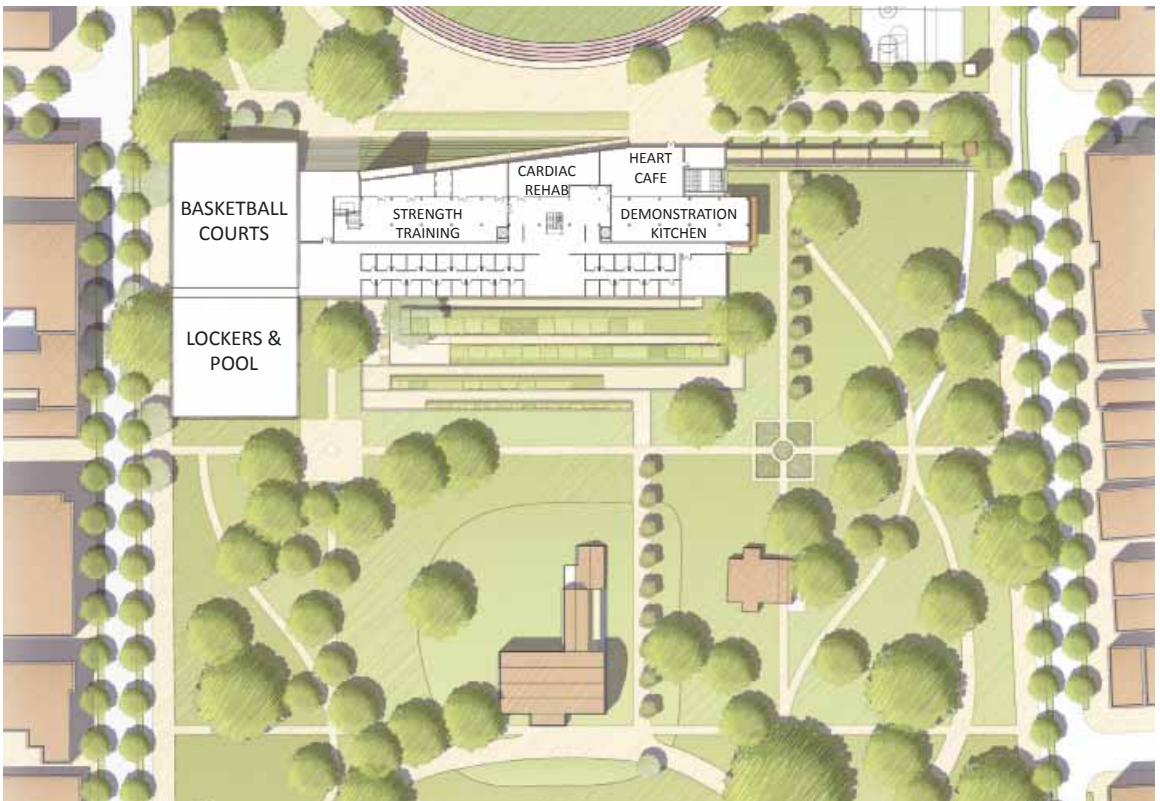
Ground Floor Plan - Jamaica H.E.A.R.T. recreation and wellness center
